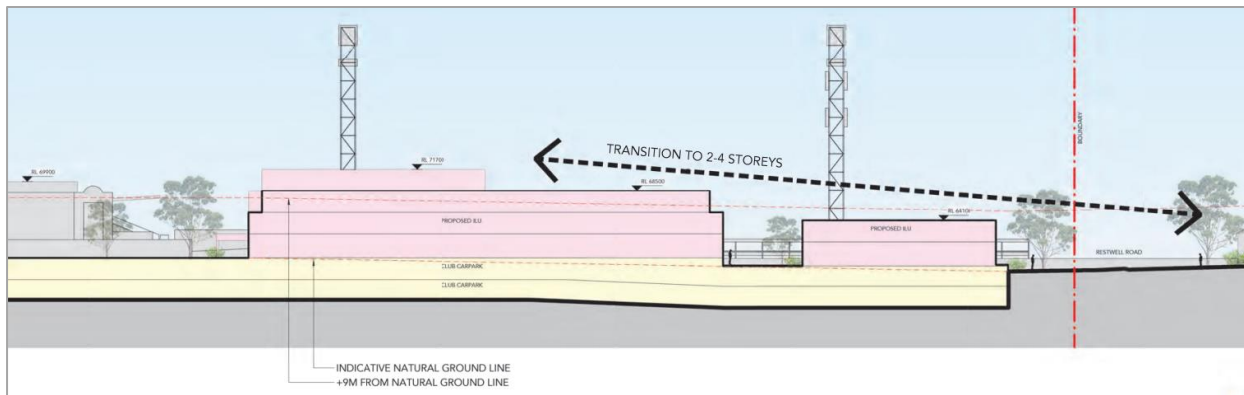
Extract of ILU Massing Section CC (Source: Team 2 Architects) (Appendix 1)
